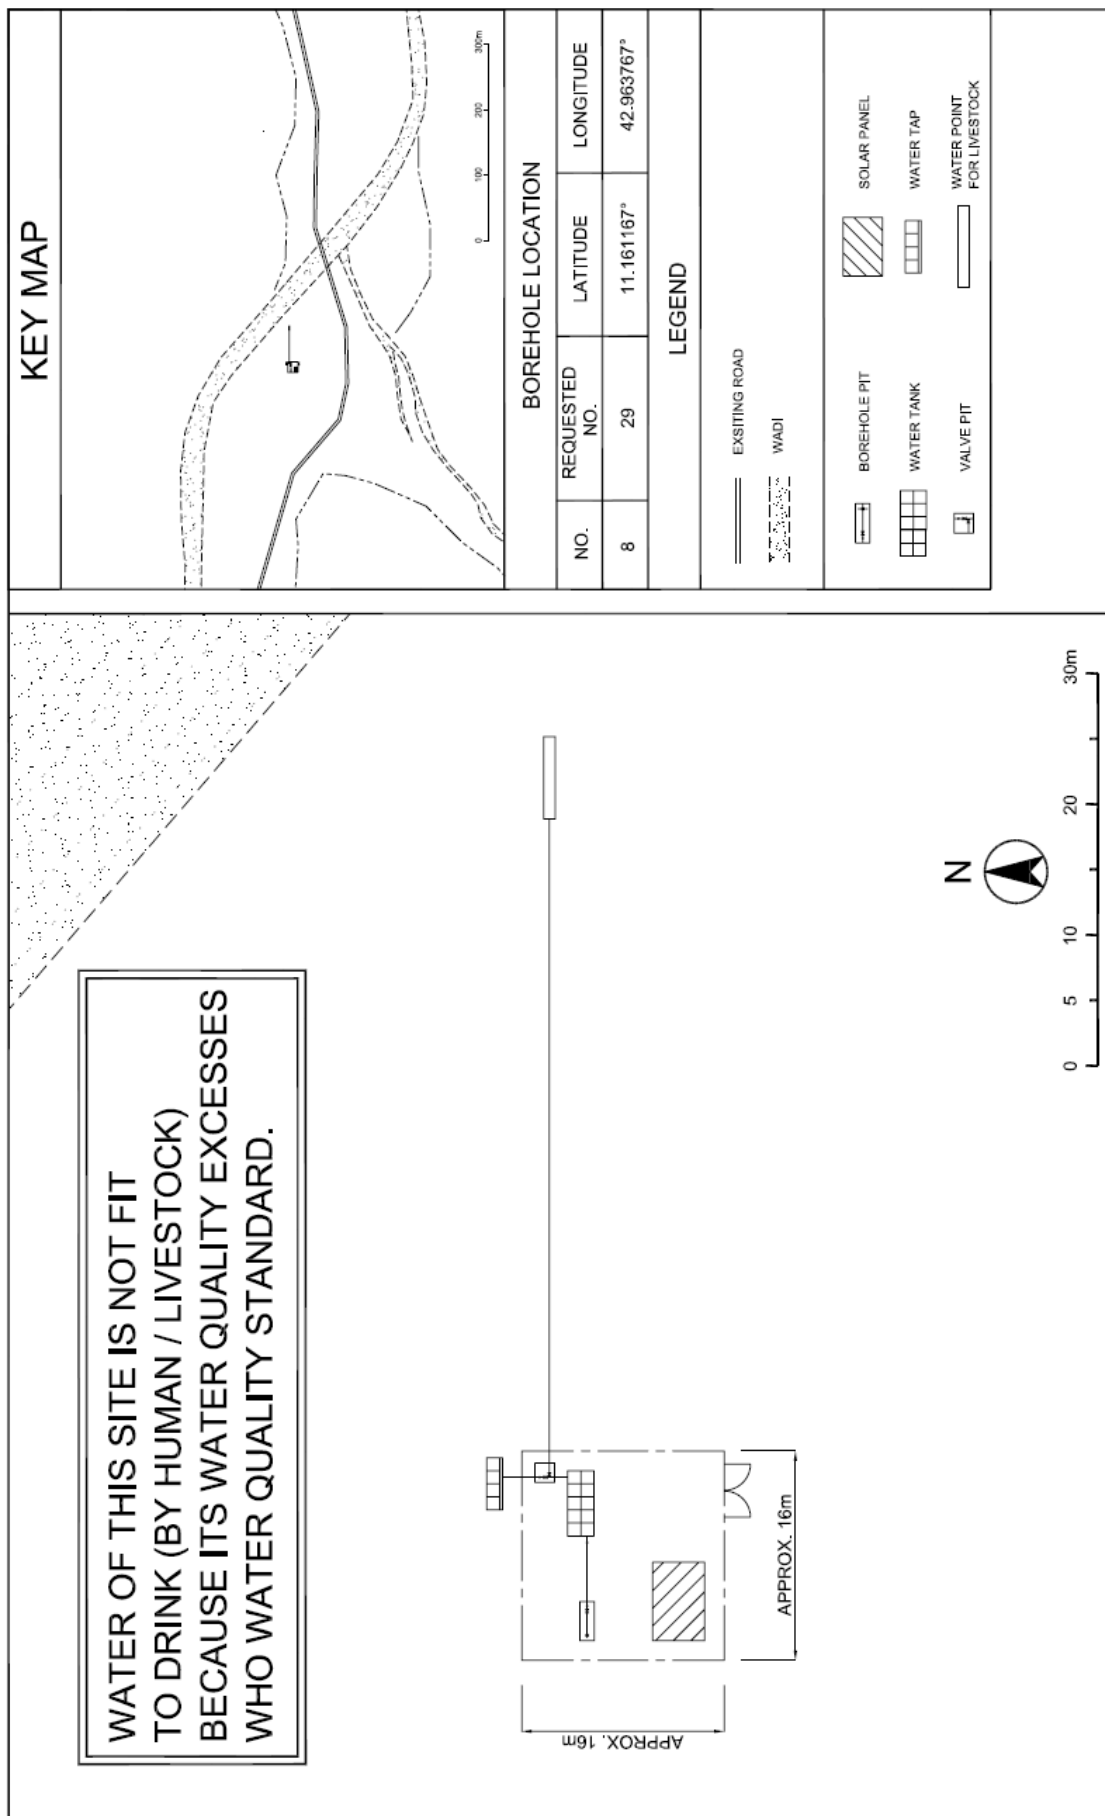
Layout of Facility (9) [Midgarra]
